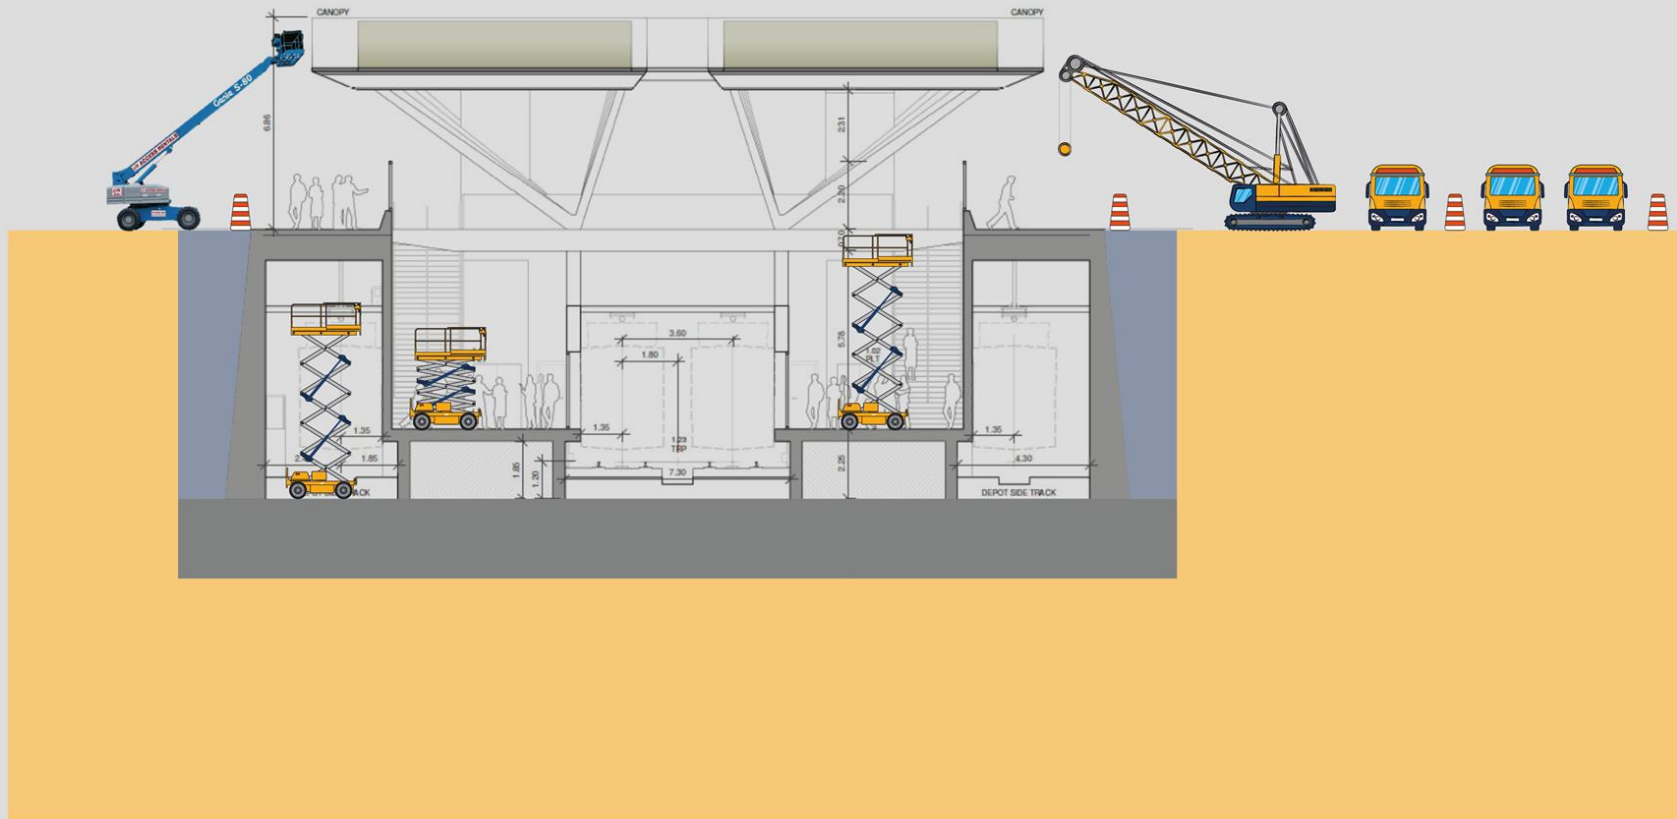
Dardistown Station Complete Roof, MEP & Fit-out
